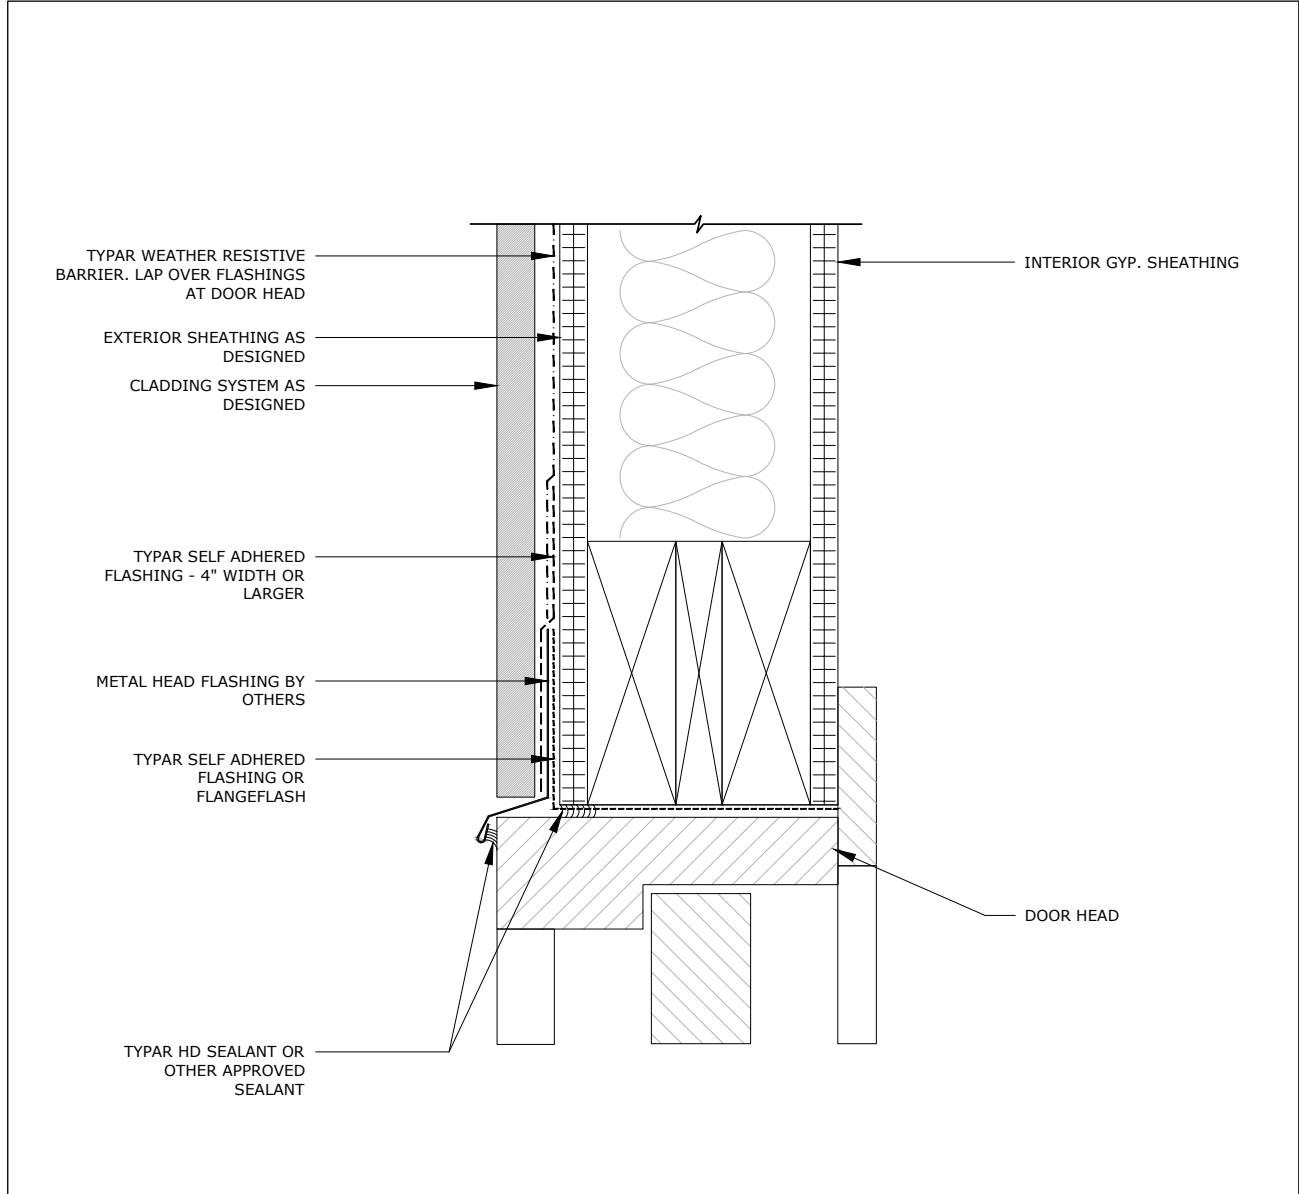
Wood Framed Door Head at Generic Cladding .....02
